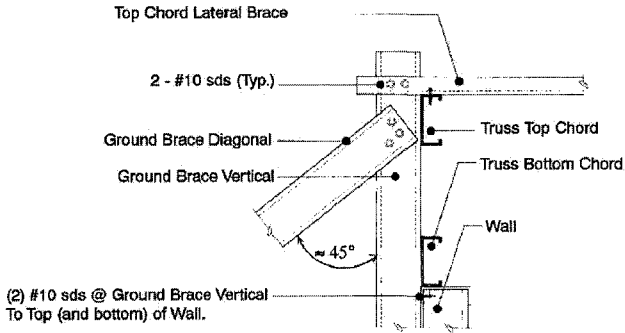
Ground Bracing Connection Details (LGSEA 1998a)
